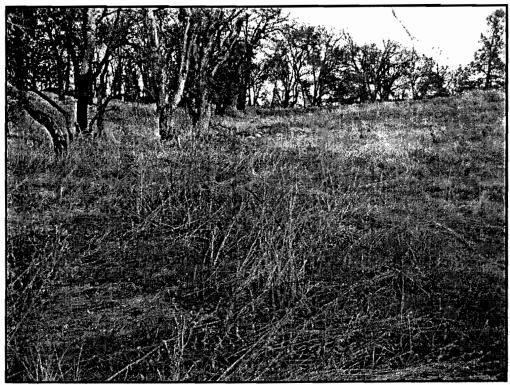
SW1 Looking Upslope at Proposed Fill Area
